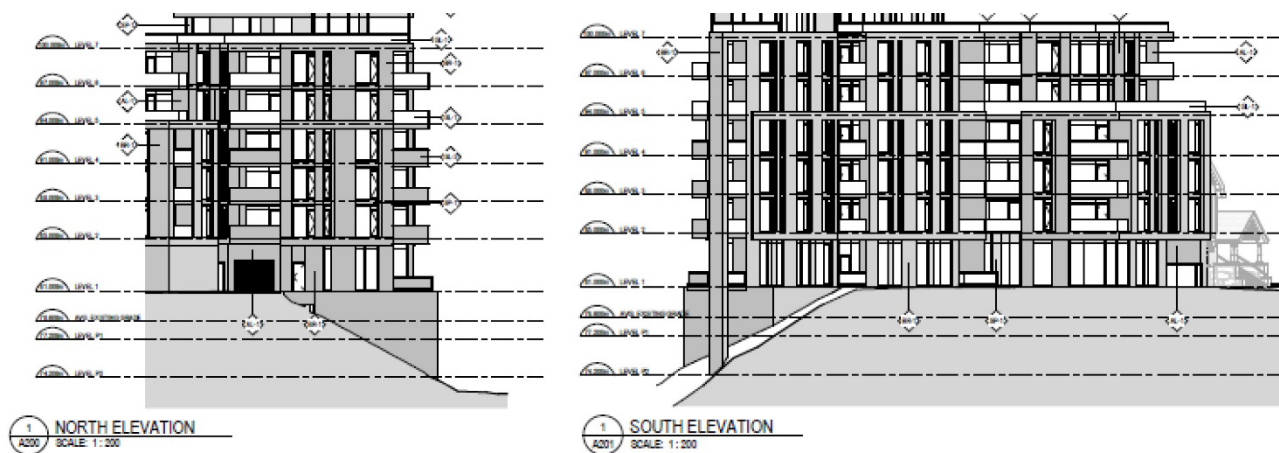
North and south elevations of the proposed development depicting the change in elevation of the subject site
